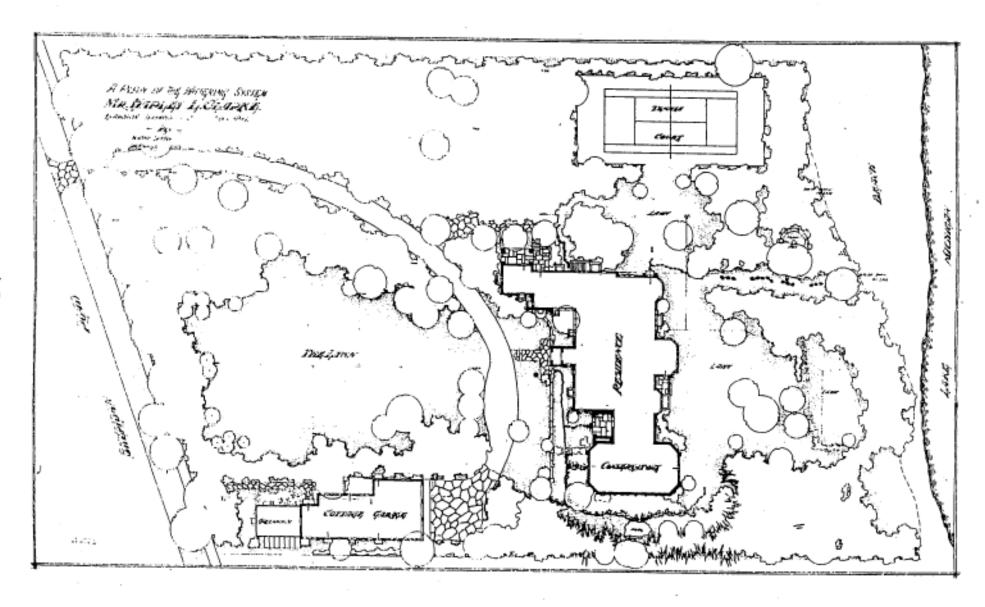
JENSEN'S WATERING SYSTEM PLAN
